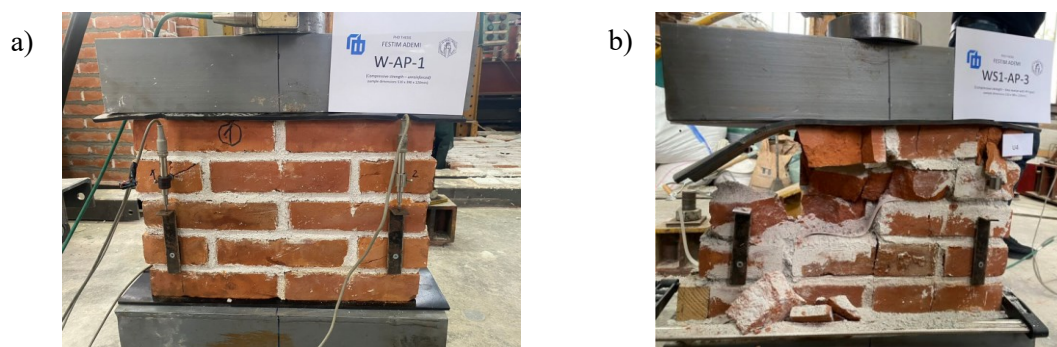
a) Testing the compressive strength of URM specimen; b) Failure mechanism of WS1_AP specimen
